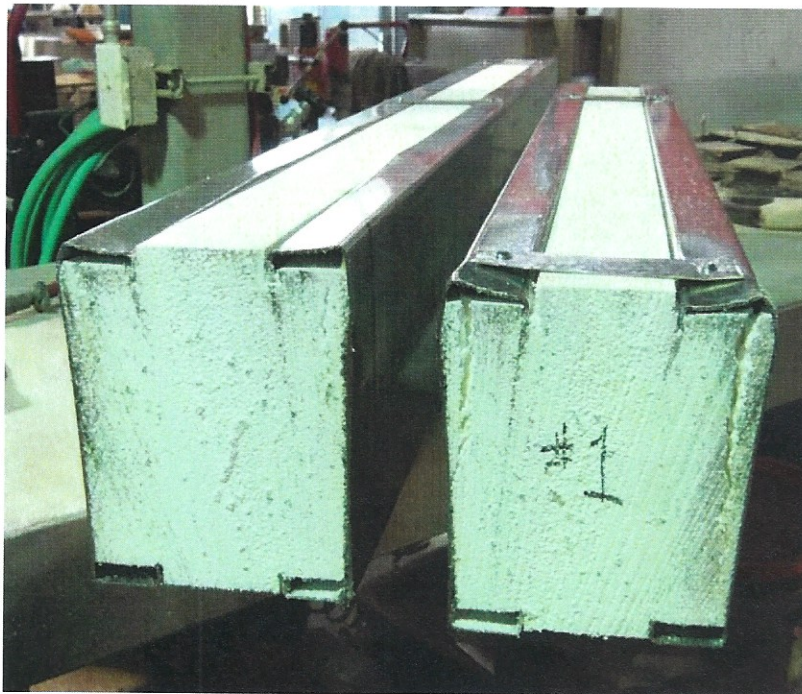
Strong Axis Bending at Failure: Compression Flange Buckling, Web Buckling, and Foam Cracking
